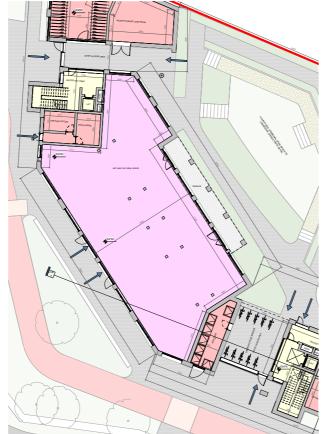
Ground Floor Plan, Site 17 showing location of Community, Cultural and Art Space in Pink
